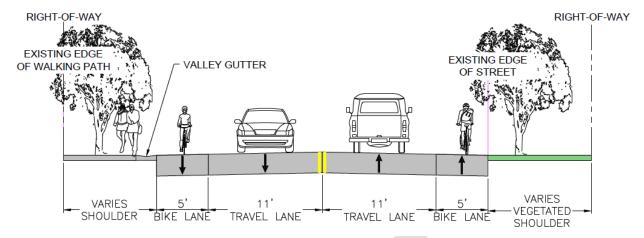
Ringwood Avenue Existing Cross Section (Menlo Oaks) Looking North Toward Bay Road
